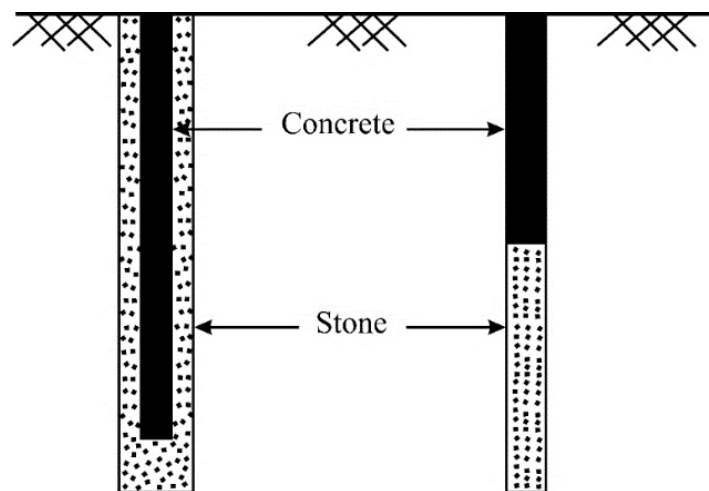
Concrete-stone column (composite form of the ordinary stone column and pile)
